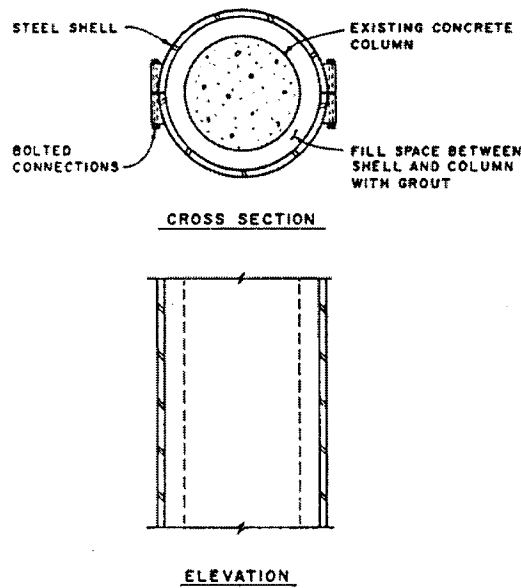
Reinforced Concrete Column Retrofit-2
